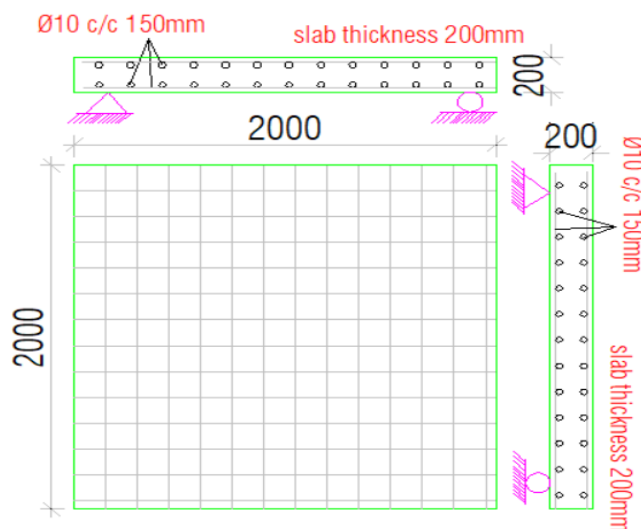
Concrete two-way slab dimension and cross section for one of the parametric study
